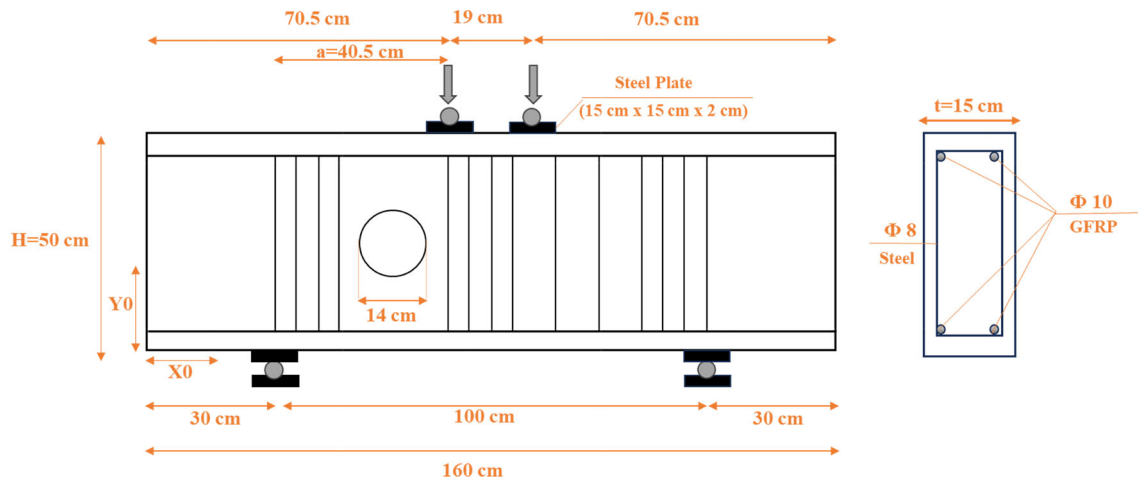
Reinforcement features for a typical test beam (N3H1LD14)
